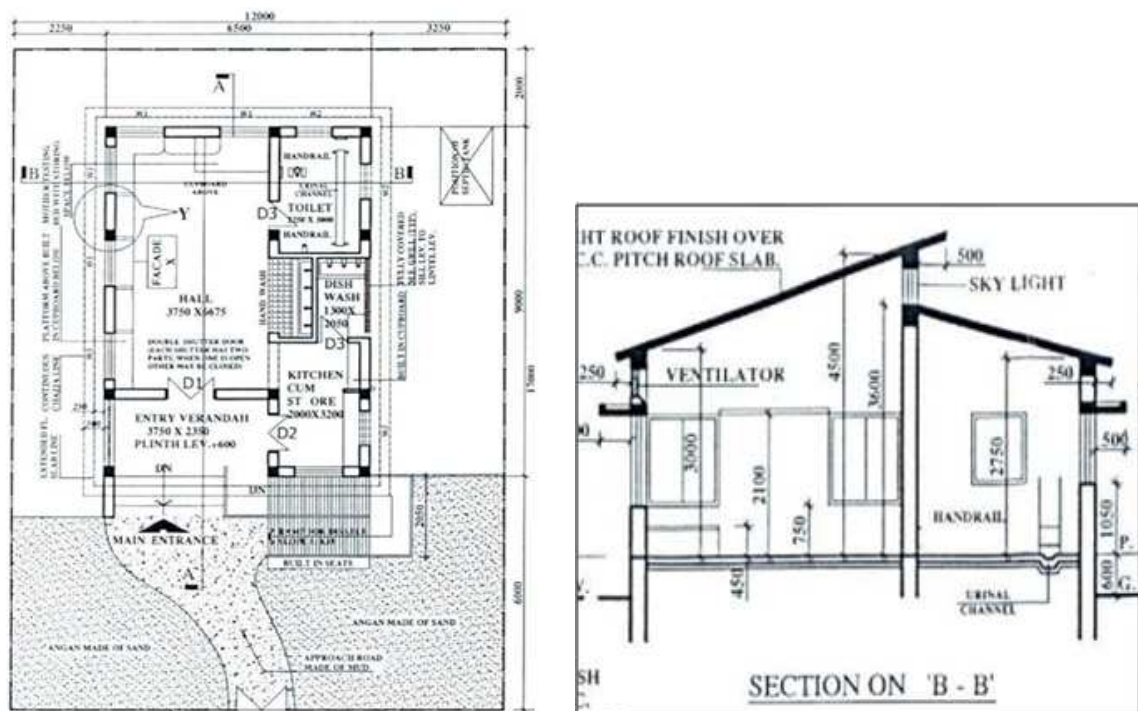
Typical Floor Plan and Section of the Reference Anganwadi Structure.
